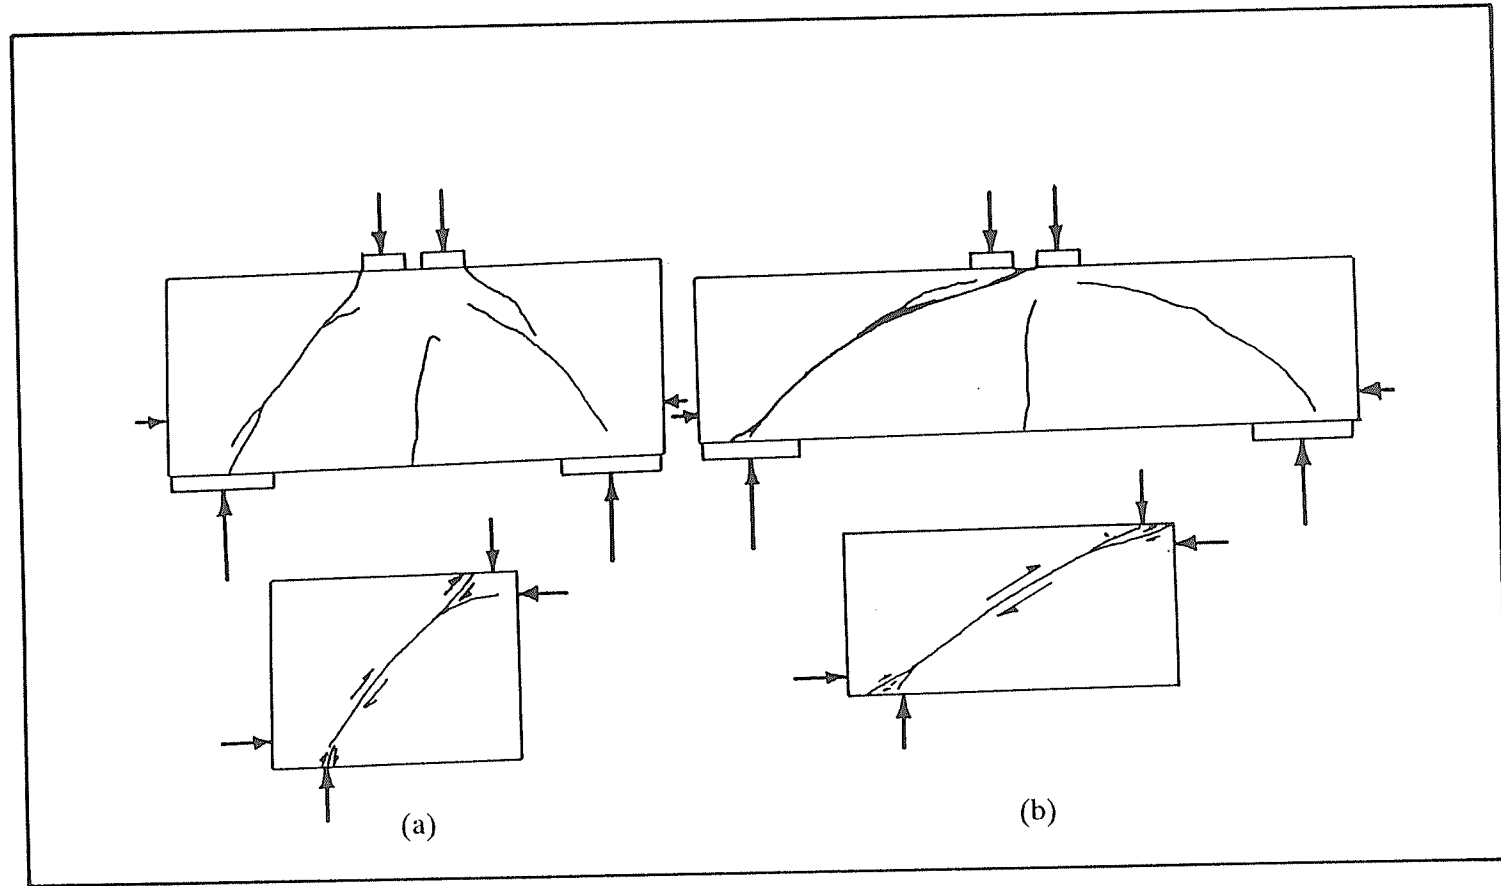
Failure mechanisms at the stage III in beam test : (a) failure of intact rock above diagonal crack and consequent shearing of the intact rock below, and (b) slip along diagonal crack.
